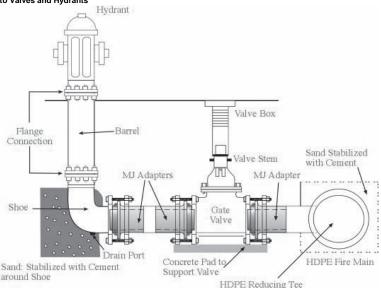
Typical Assembly and Support Arrangement for PE Pipe Connections to Valves and Hydrants
